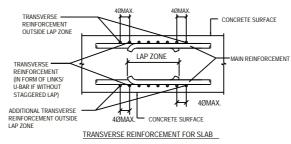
DETAILS OF MINIMUM TRANSVERSE REINFORCEMENT IN LAP ZONE
